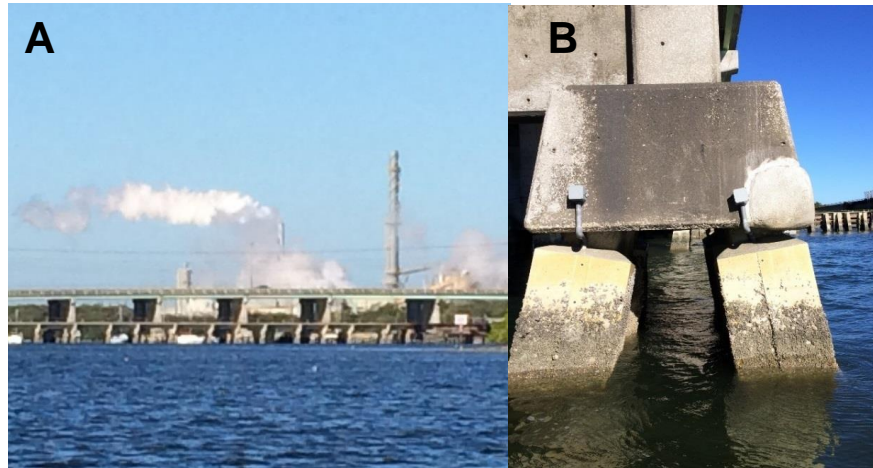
Images of the US-41 Bridge over Alafia River (Site 3).
